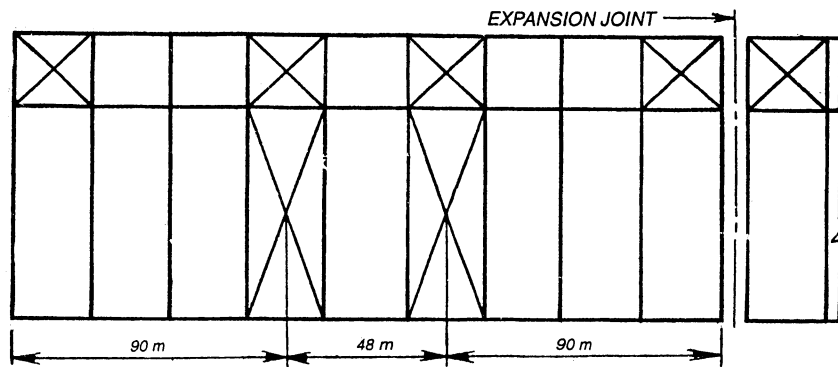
Maximum length of buildings/section with two sets of column bracings.
